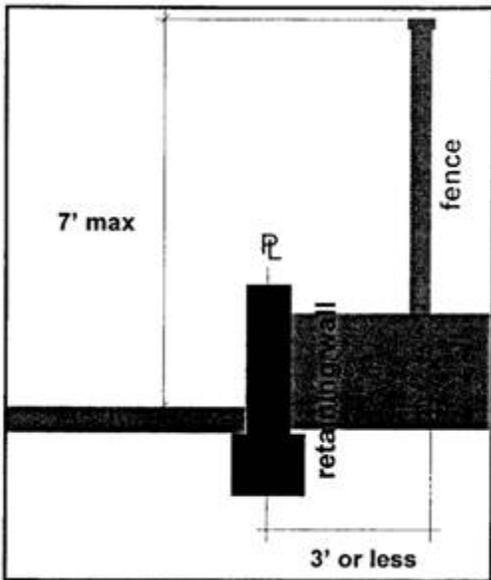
Fence on or Within Three Feet of Retaining Wall
